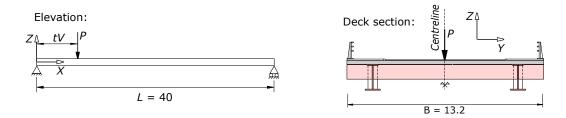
Elevation and deck cross-section of the proposed simply supported bridge (SSB). Dimensions in meters.
